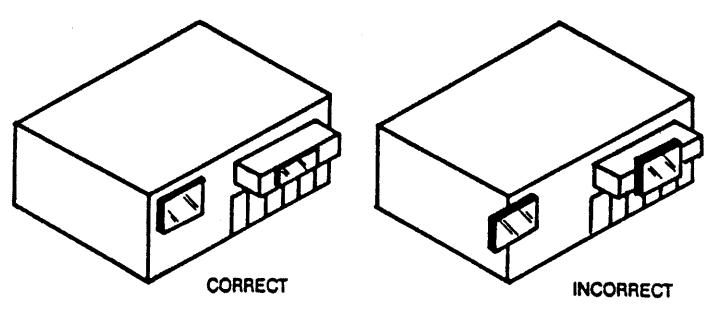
A Building Sign Shall Not Extend Beyond Any Edge of the Surface to Which it is Attached
